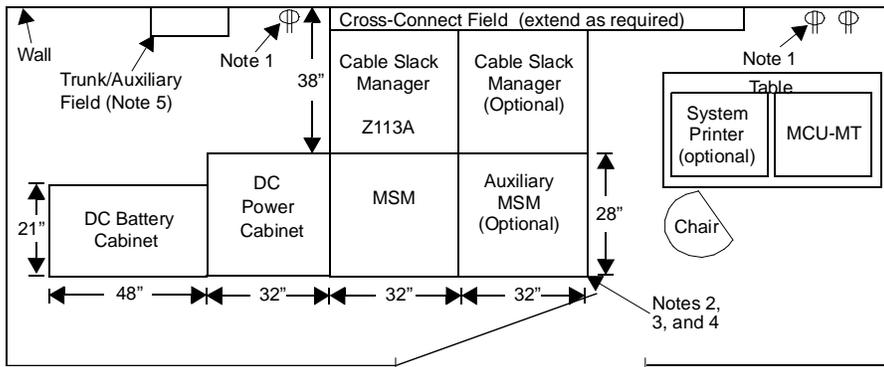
Typical Floor Plan for DC-Powered MCU with Single Carrier MSM
